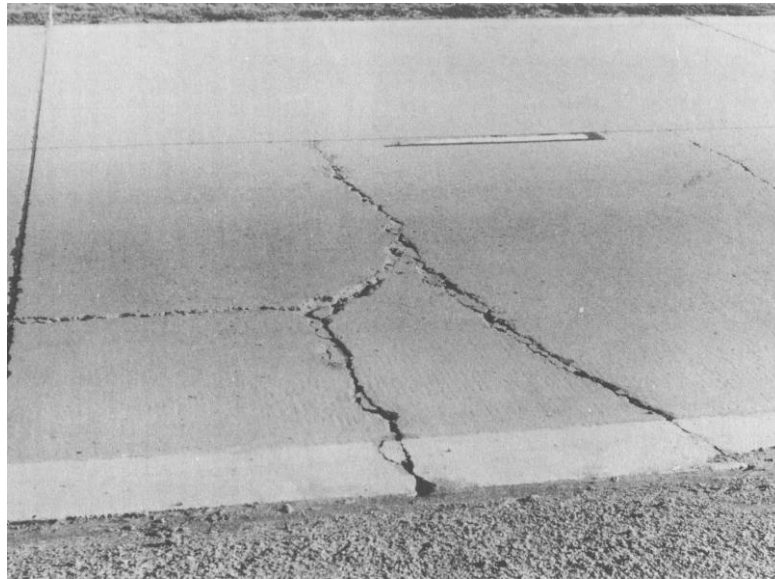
Cracks in an unreinforced concrete pavement (Croney and Croney, 1991)
